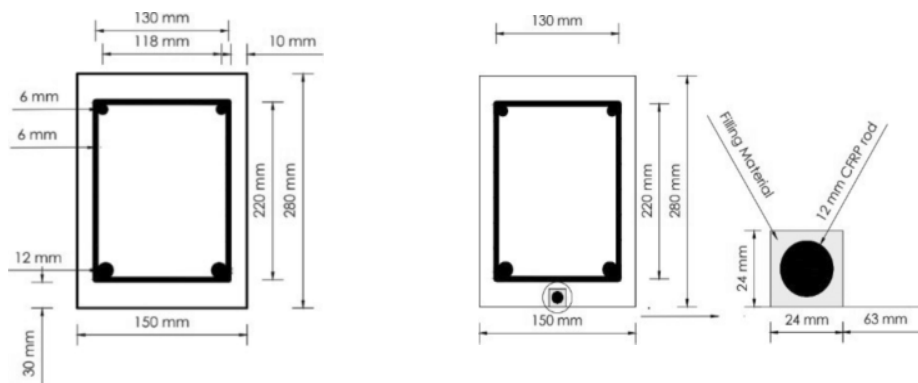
Un-strengthened and Strengthened Beam Cross Sections with 1, 12 mm FRP Rods,
